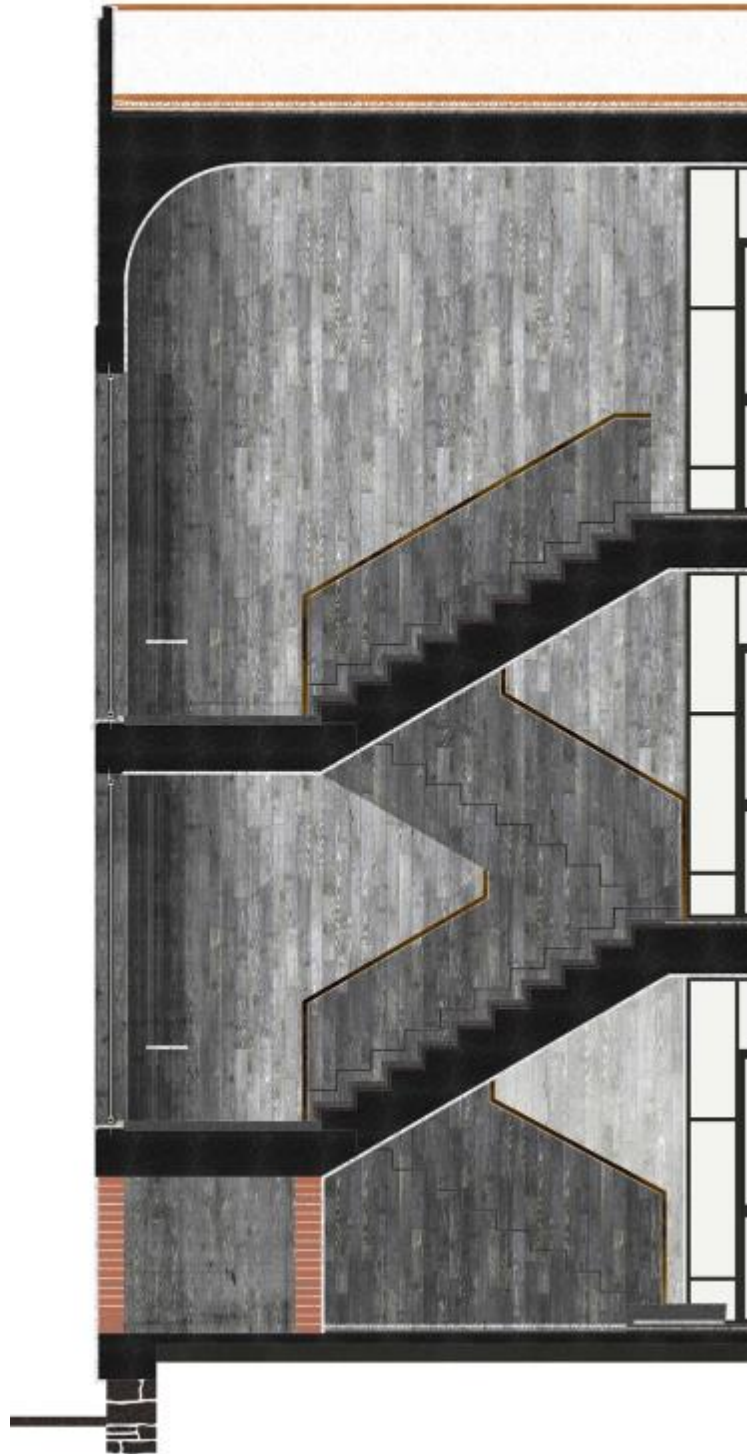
Section drawing of the stair shaft attached to the classroom block of the School of Mathematics building with sculptural beton-brut balustrade. (Produced by the Author.)
